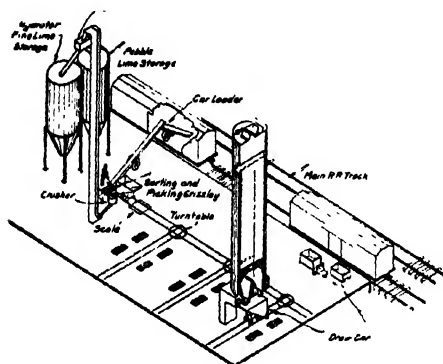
Plan of lime handling system with kiln cut away to show inner construction.
